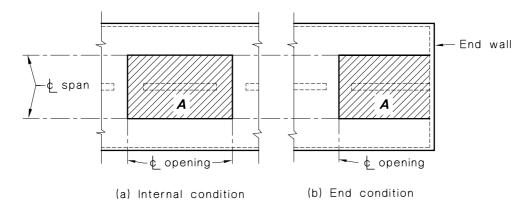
WALLS WITH MAJOR OPENINGS (Principal reinforcement in one direction only)
